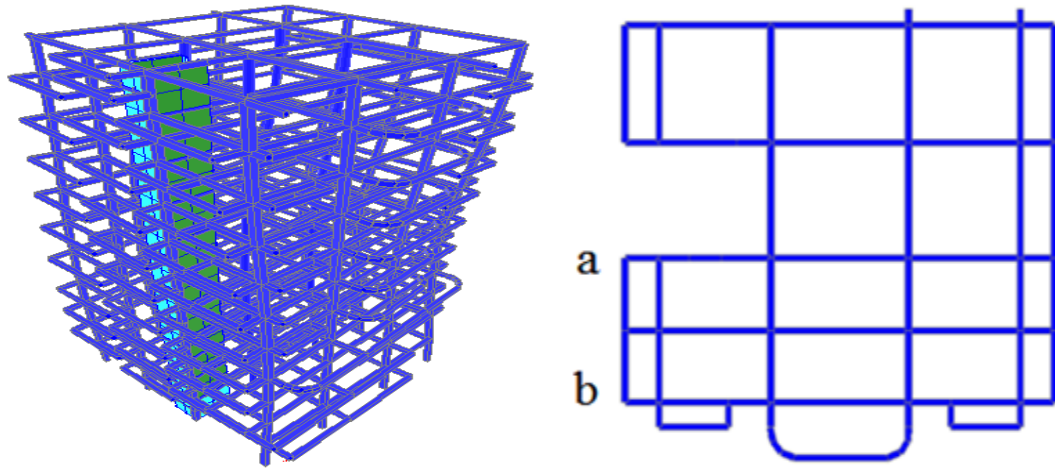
The deformed shape of building D (after analysis at 4th mode)
